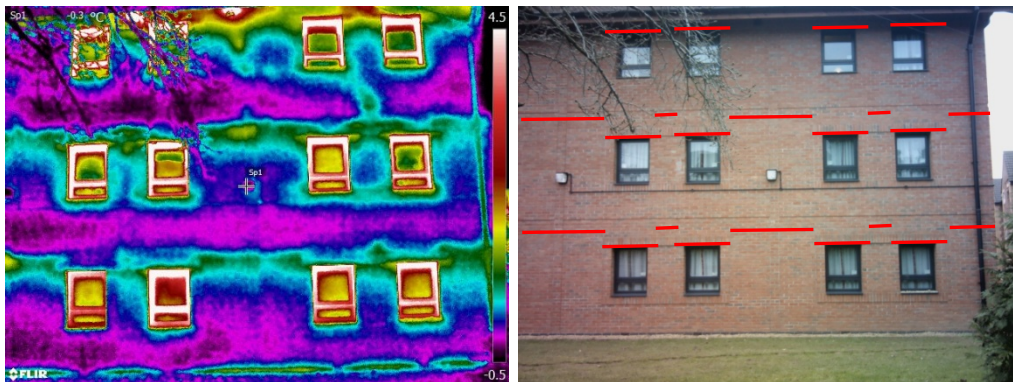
(left): IR thermal image of modular walls with windows with brick cladding
